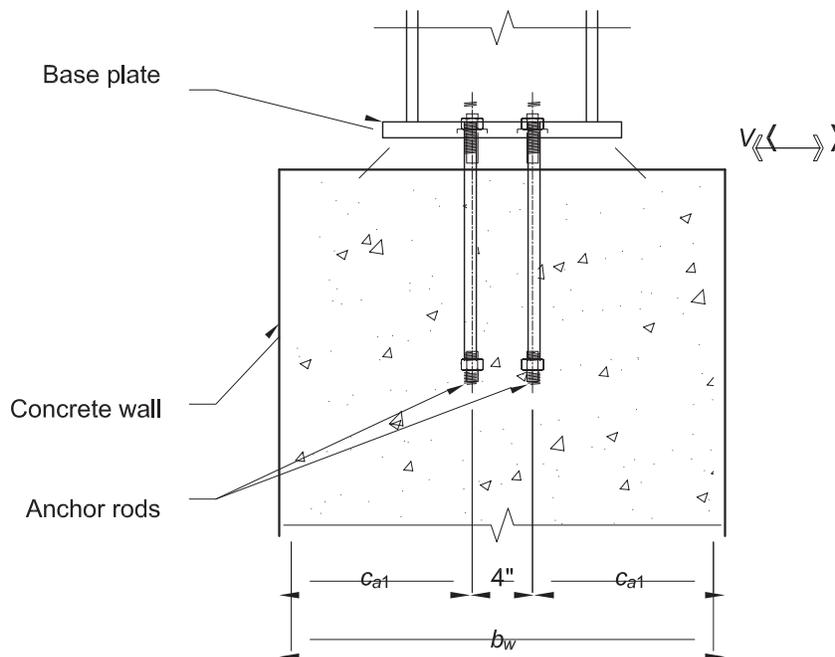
Base connection section for configuration used in Example 4.7-4.
